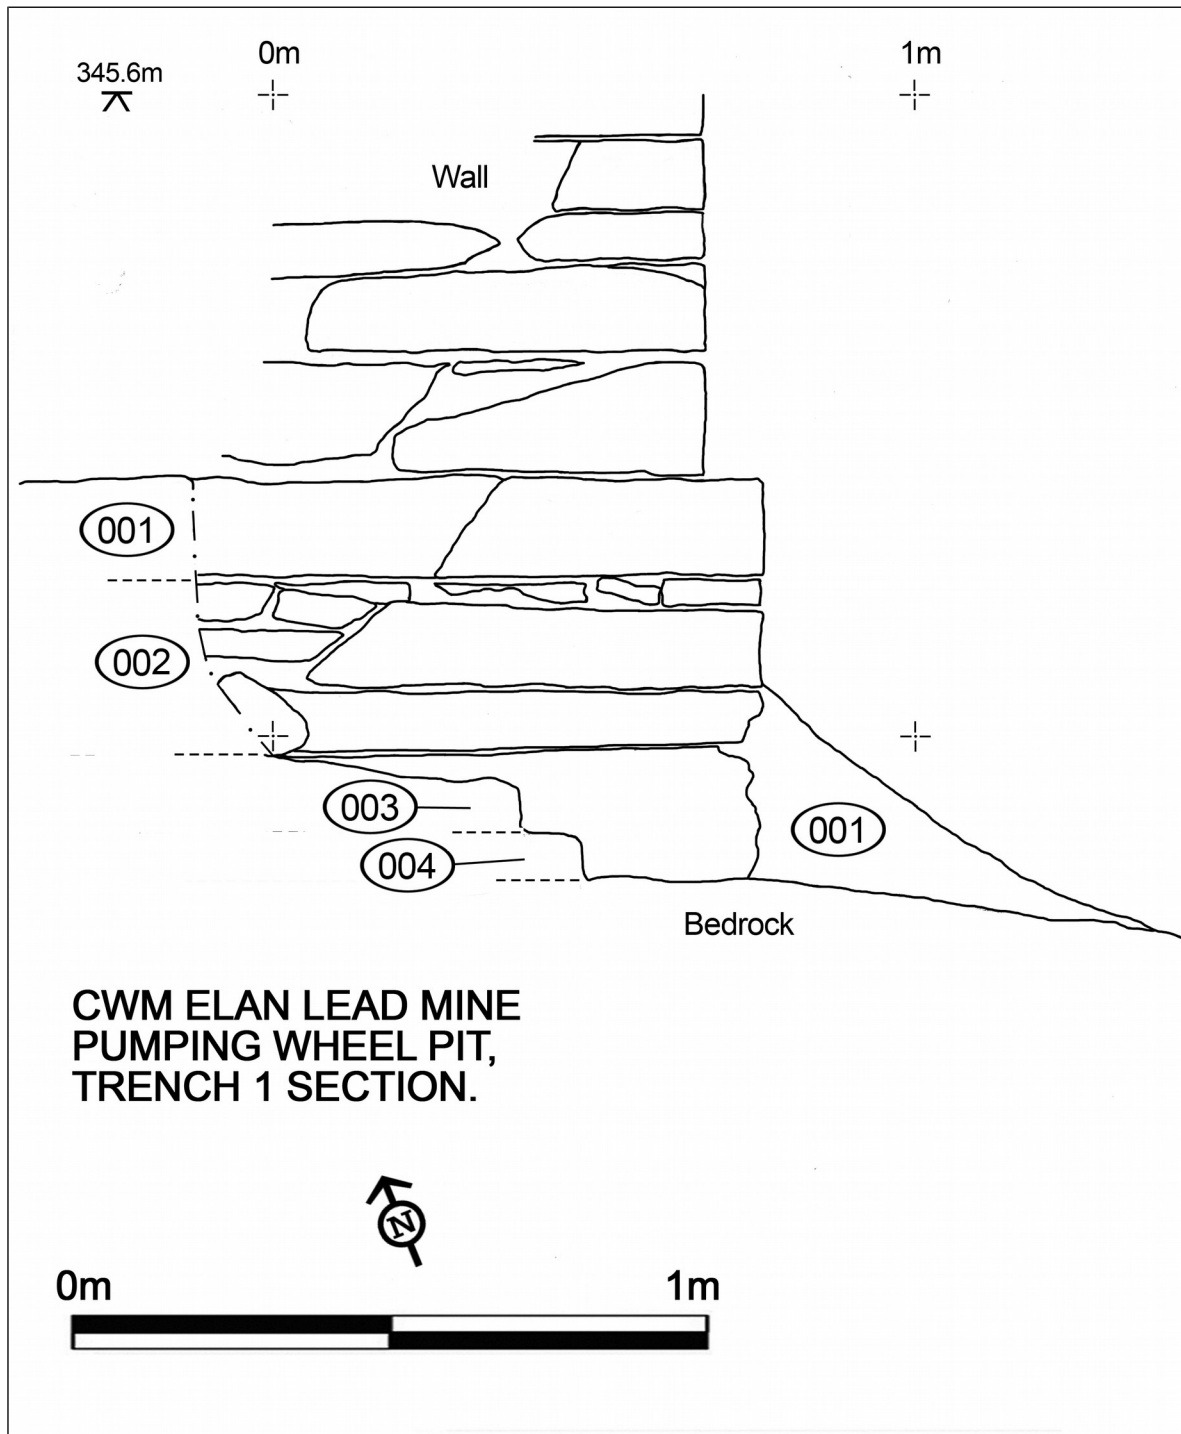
Section showing the wheel pit wall, its plinth courses and the excavated section, drawn at 1:10
